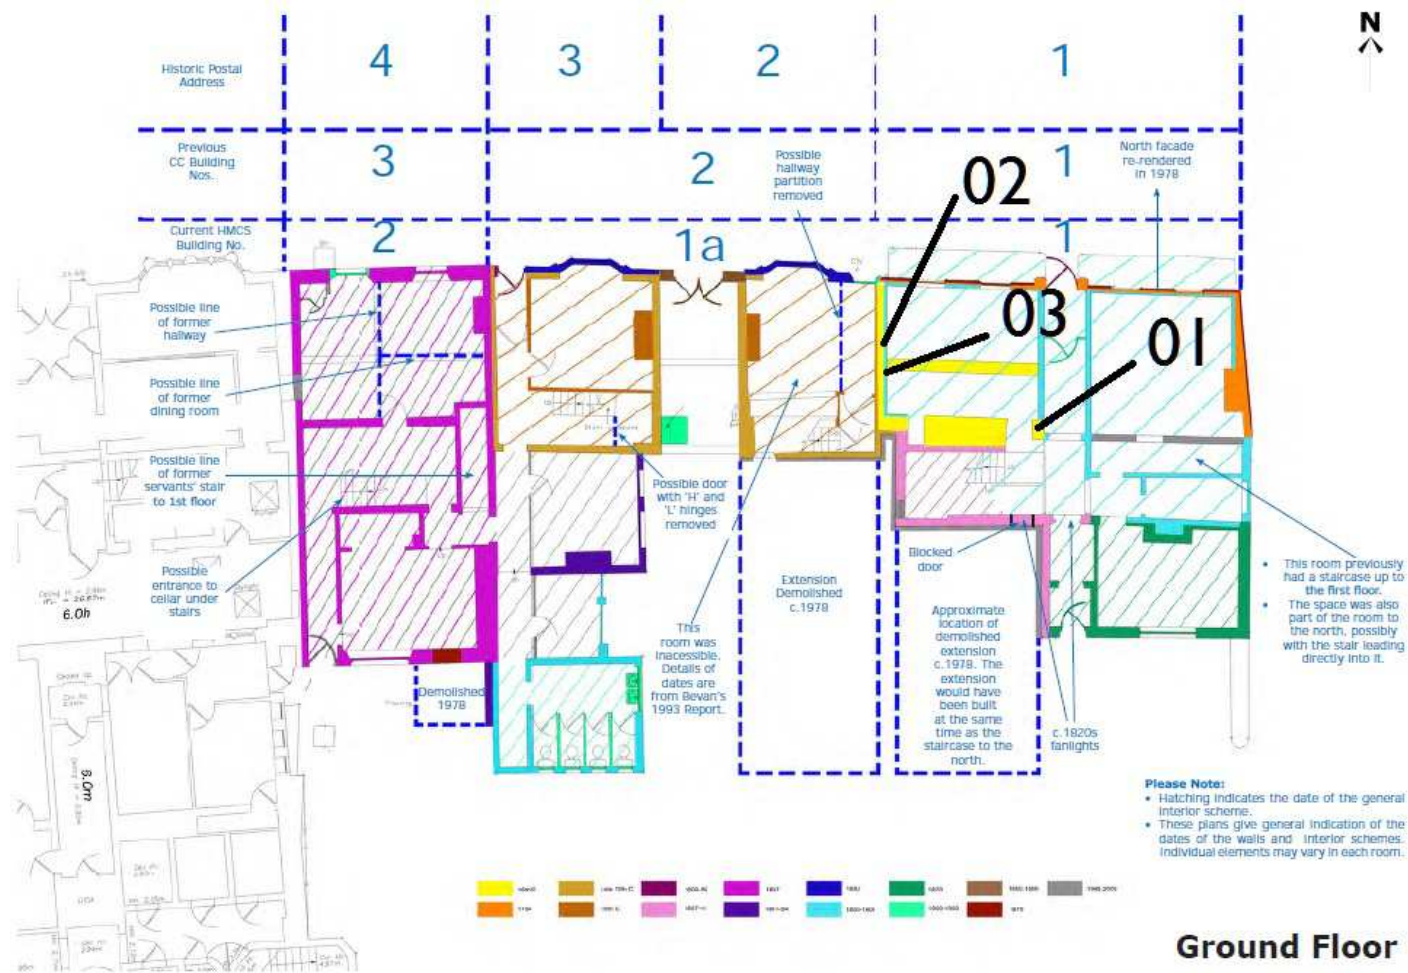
Plan of the ground floor of 1-4 St Paul's Square, Bedford, showing the approximate locations of samples taken for dendrochronology. Adapted from an original plan (Purcell Miller and Tritton LLP 2009)
